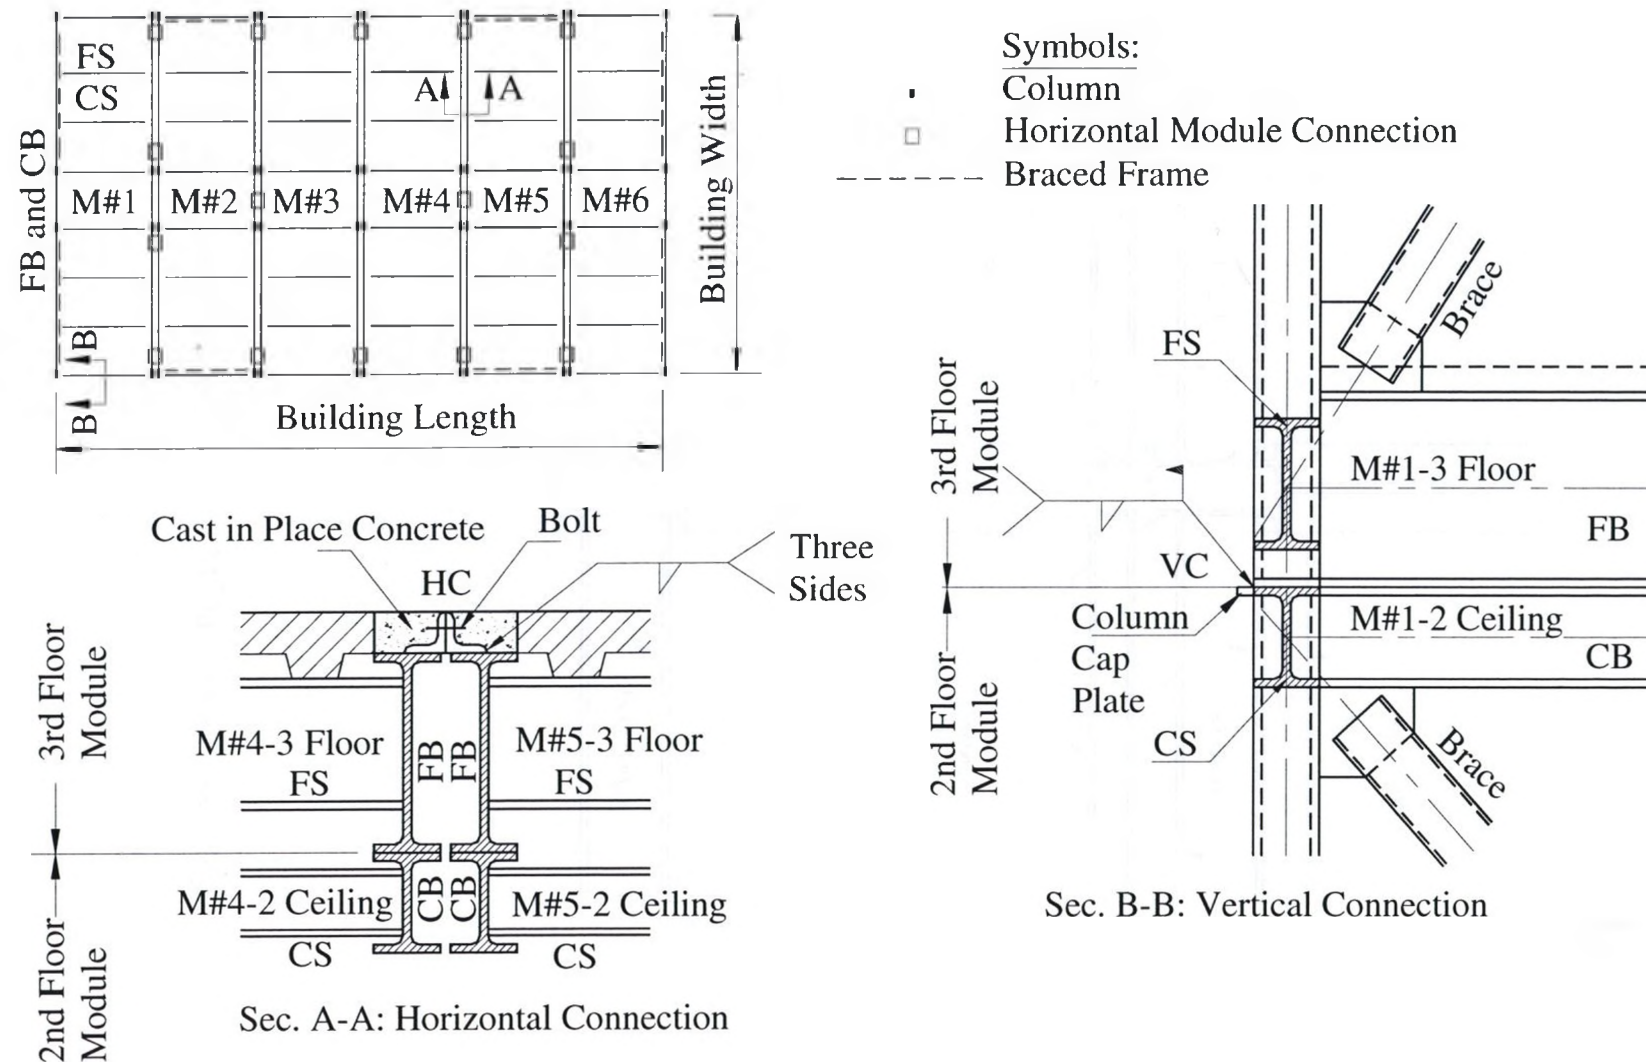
A Typical Floor Plan and Sections of a Multi-Storey Modular Steel Building
